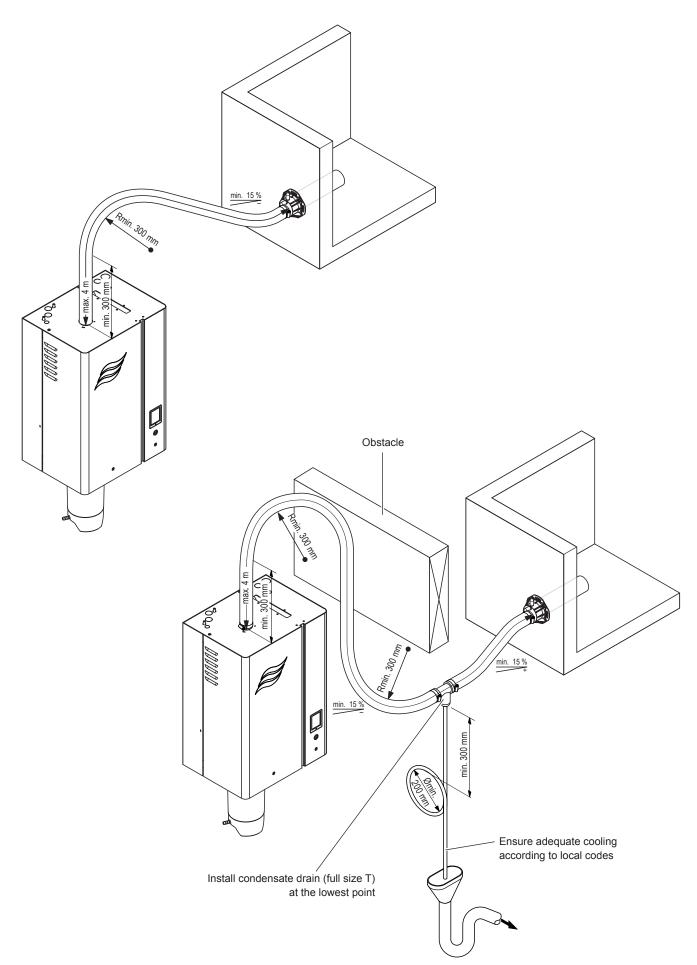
Steam distributor mounted less than 500 mm above the top edge of the steam generator
